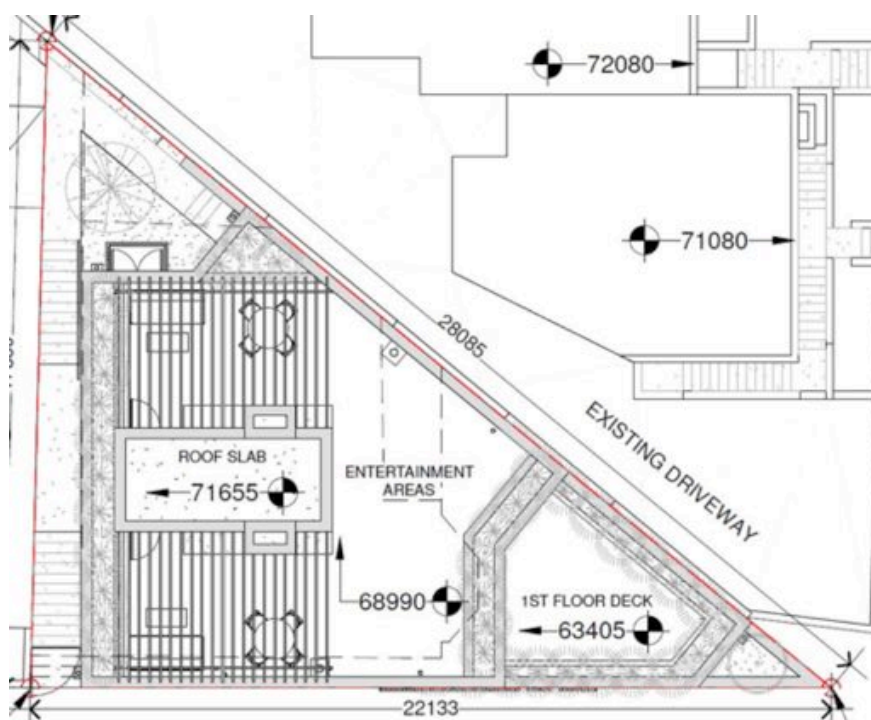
the roof terrace, showing the pergola and the stairwell structure set back on it
